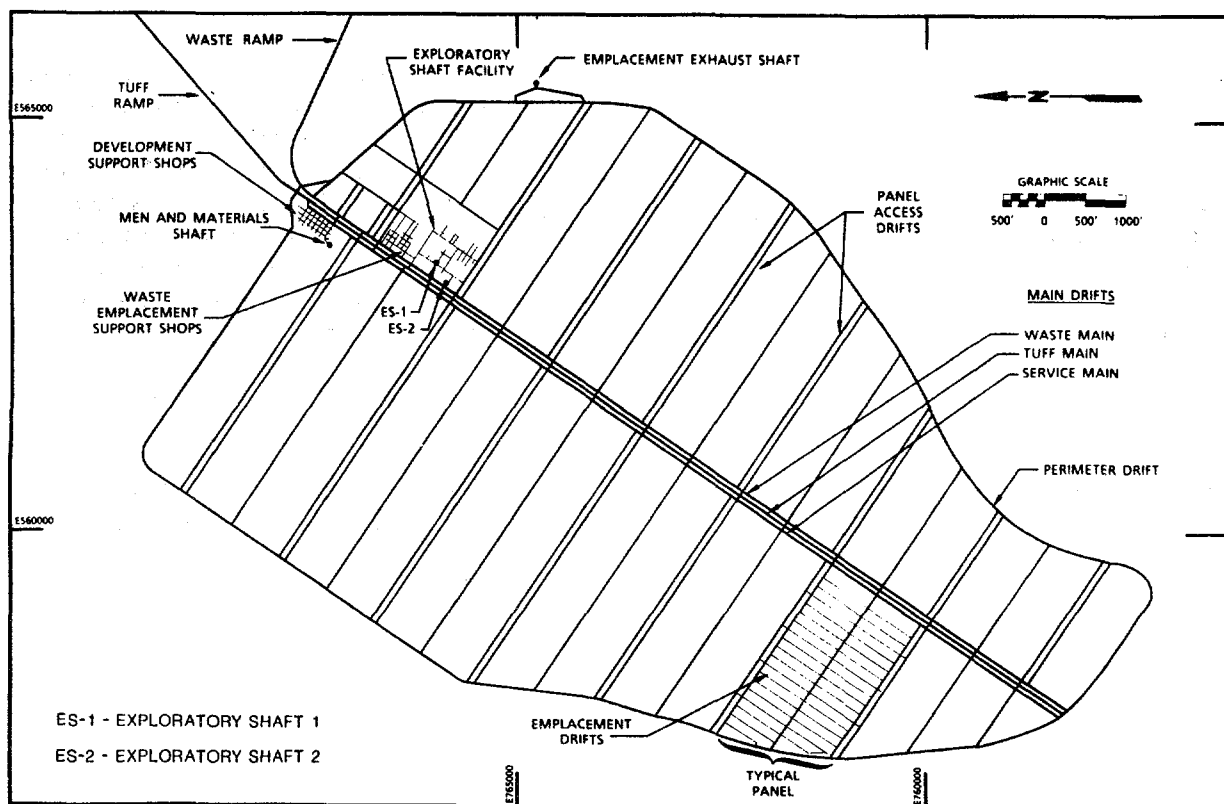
Underground repository layout for the vertical waste-emplacement configuration.
